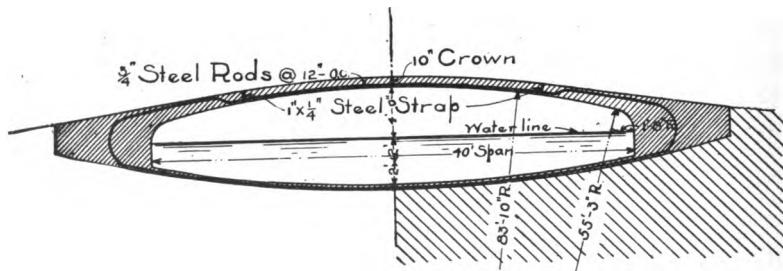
Section of a Bridge With Forty-Foot Span, Lafayette, Ind.
